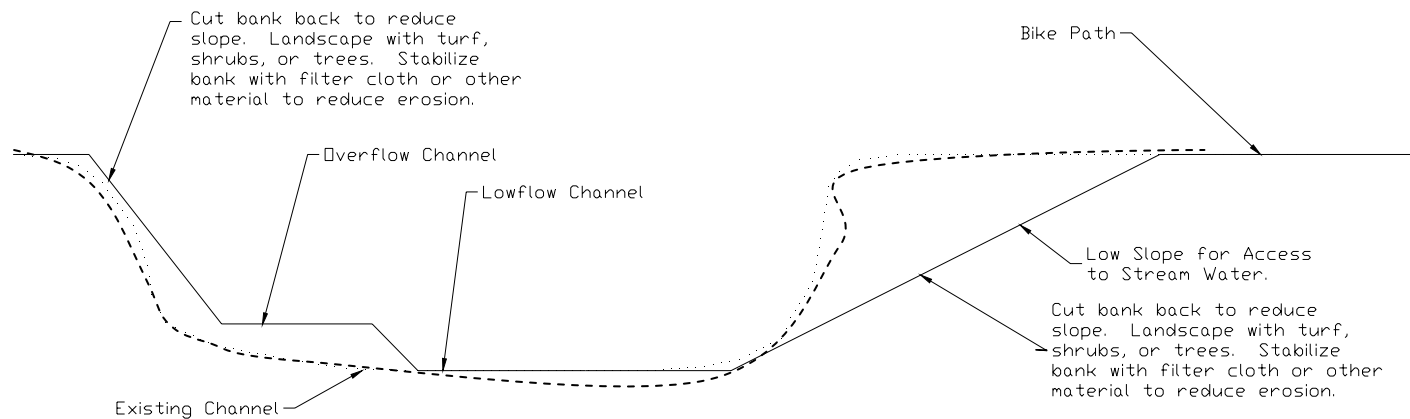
Proposed Cross-Section, Manoa-Palolo Canal.
